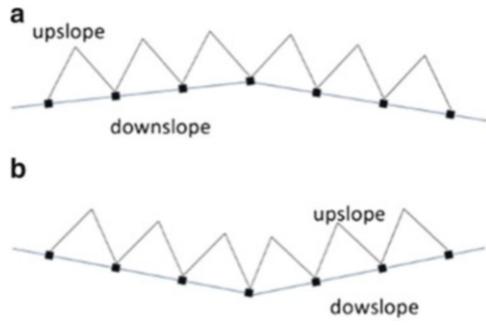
Example of two possible planimetric distortion of installed rockfall barrier: large deformation in case (a), and possible tilt of the post in base (b)
